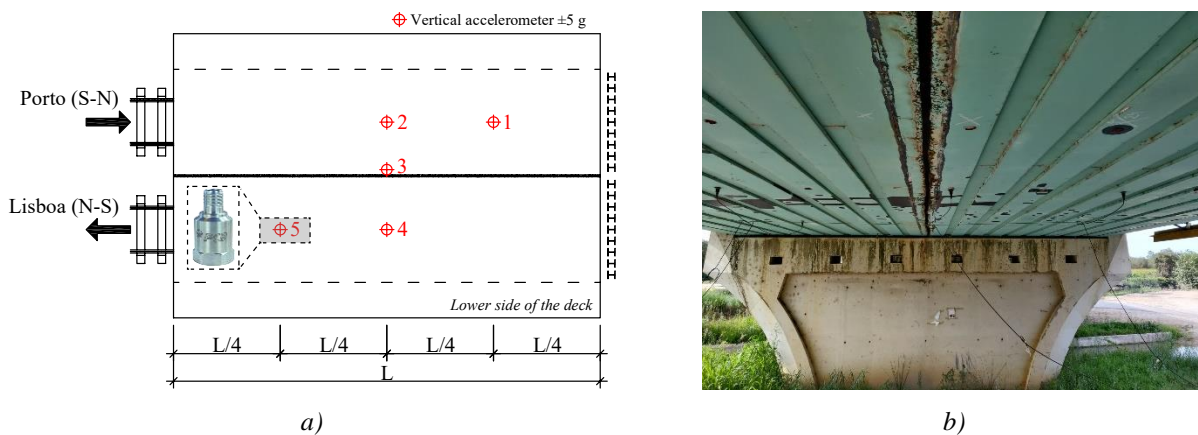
Test under railway traffic performed in the Canelas bridge in Portugal: a) instrumentation setup and b) accelerometers installation in the lower face of the deck.
